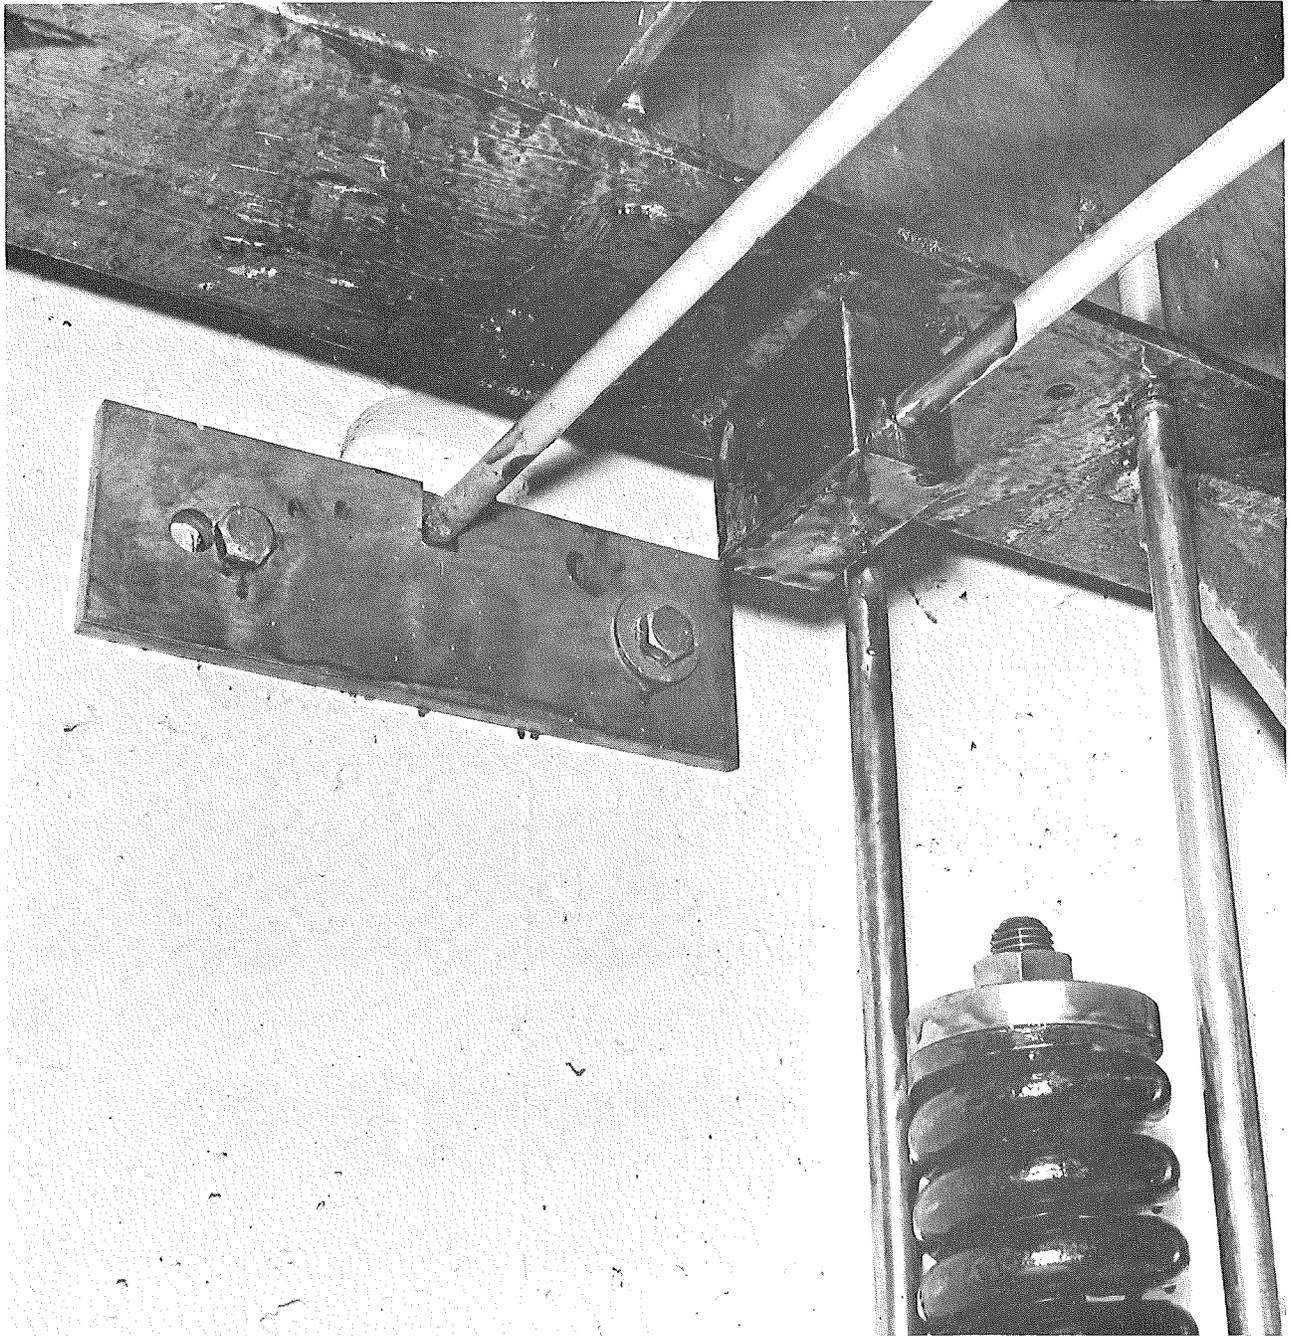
Platform transverse anchor rods showing one wall anchor and one rod-to-platform attachment block.
